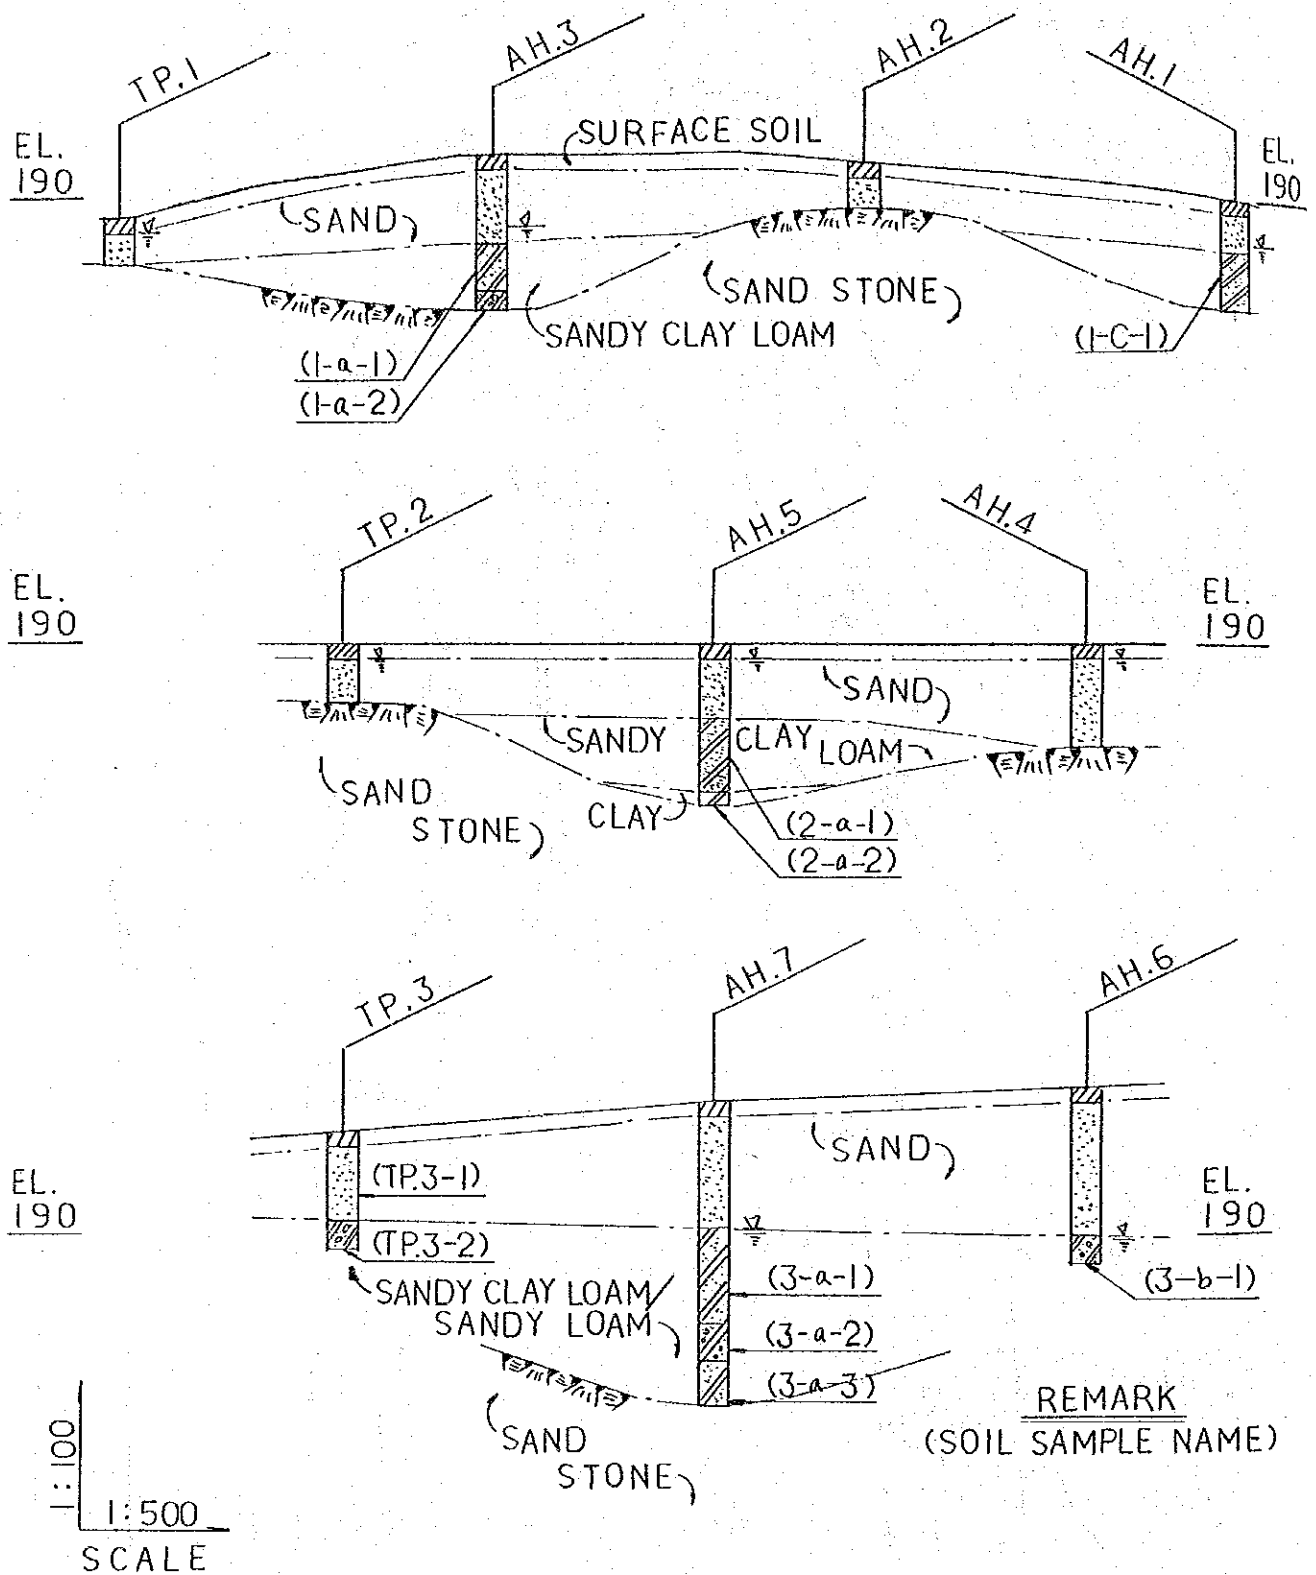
GROUND CONDITION AT RESERVOIR SITE
